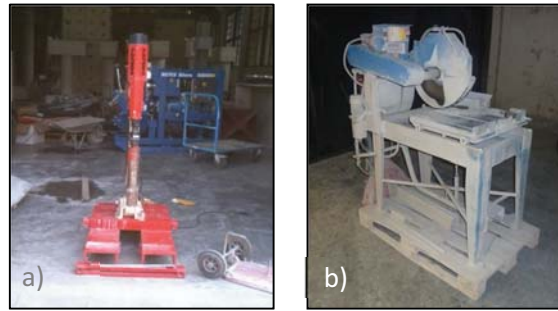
Extracting machine a) and radial disc cutting machine b)
